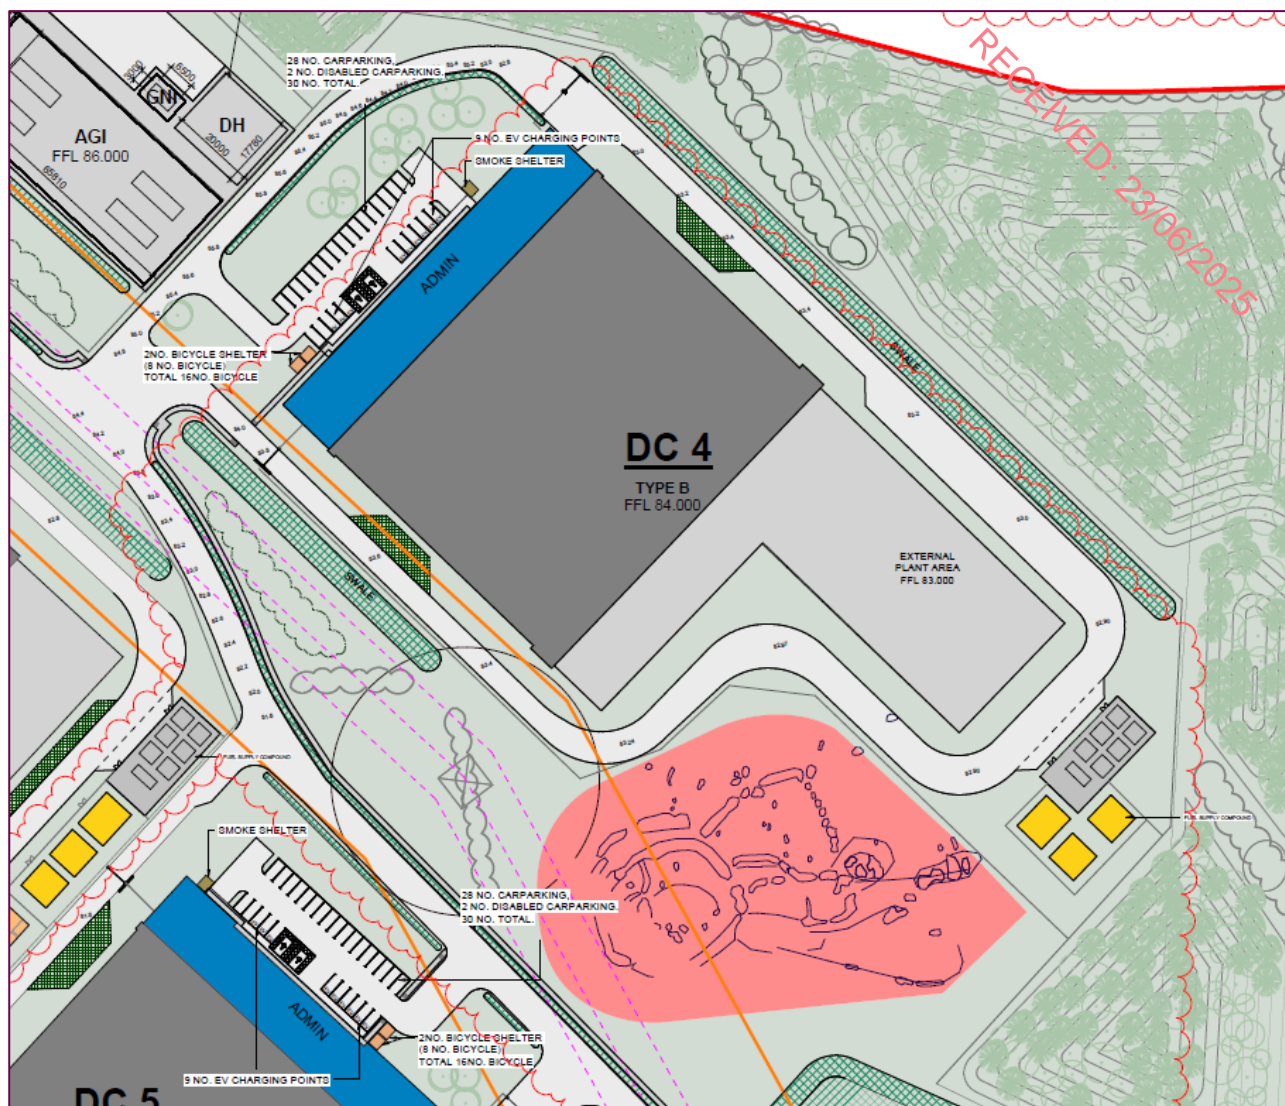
Amended Proposed Site Plan (extract of now submitted drawing 22217-RKD-ZZ-ZZ-DR-A-1012-PROPOSED SITE PLAN B)
